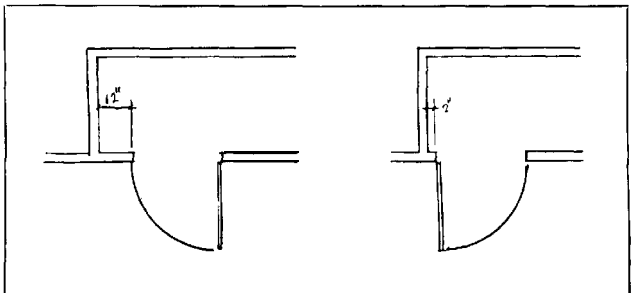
Where the door exits to a hallway, leave at least 12 inches clearance on the latch side-and 2 inches on the hinge side—before an obstruction, such as a partition.
